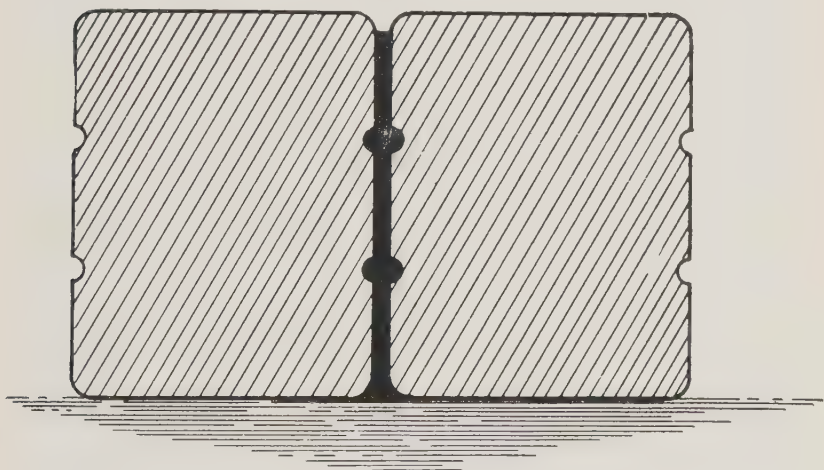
A grooved paving block cut in two pieces and the two halves placed side by side. Drawing by C. H. Richardson.
